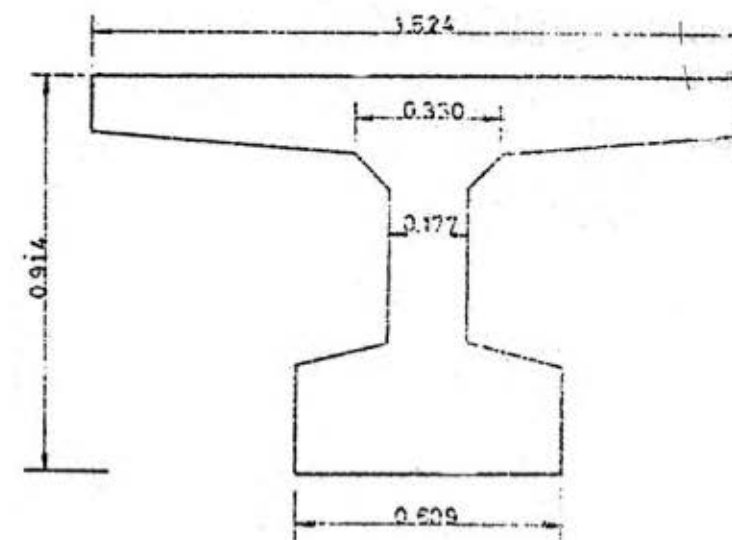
DEFINITION OF THE BRIDGE DECK
